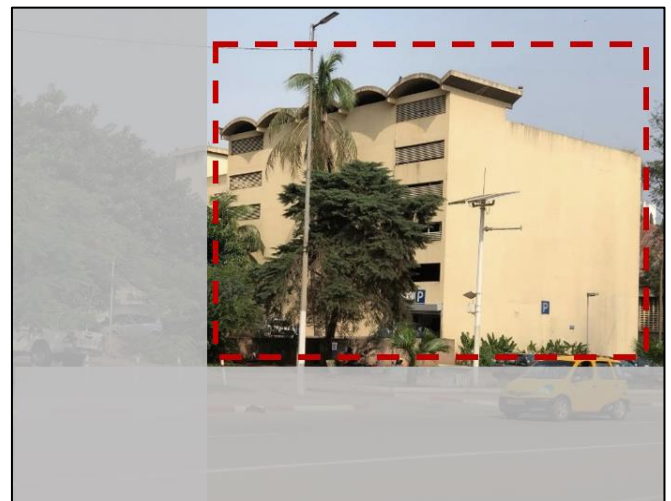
Multistorey Parking Facility, First Ministerial Building, Yaounde
